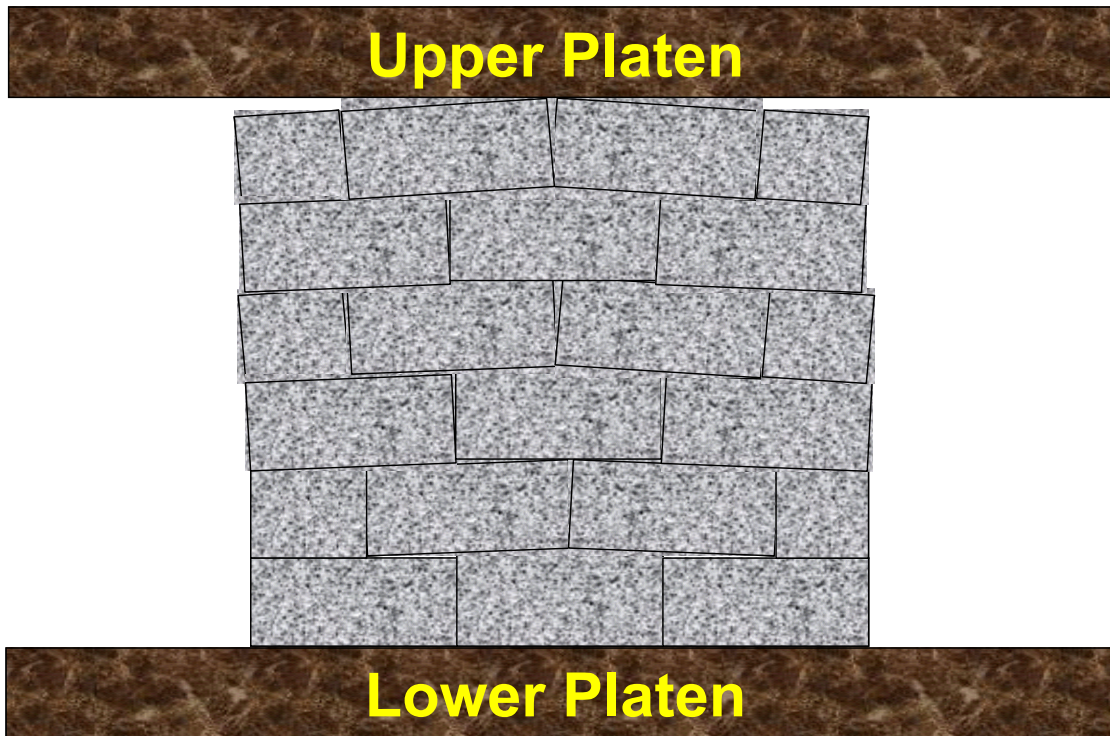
Illustration of how block dimensional tolerances can cause localized loading on a three-block-wide wall (not to scale).
